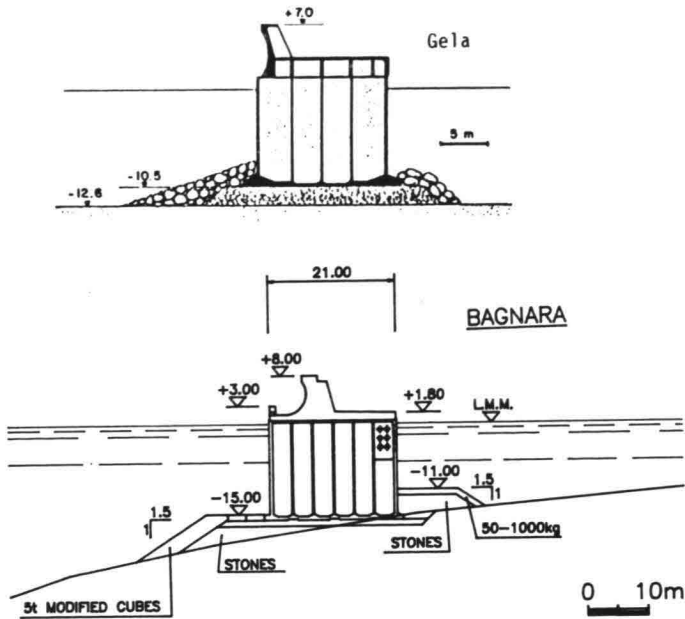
Sections of two modern caisson breakwaters damaged in 1991
